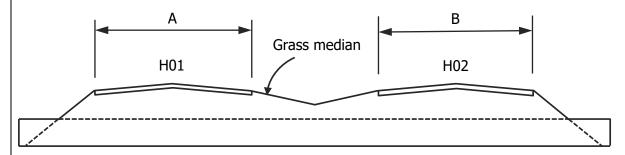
Cross-section view of two highway features carried on the pipe culvert under fill with a grass median.
